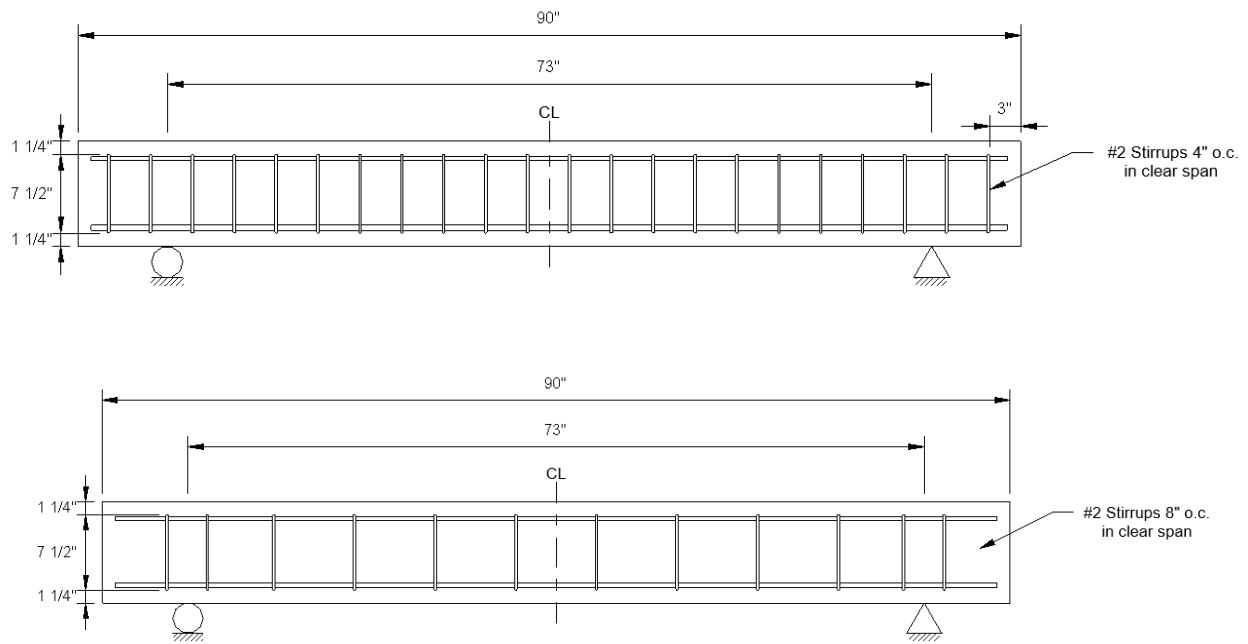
Longitudinal Cross Sections of Laboratory-Scale Beams
